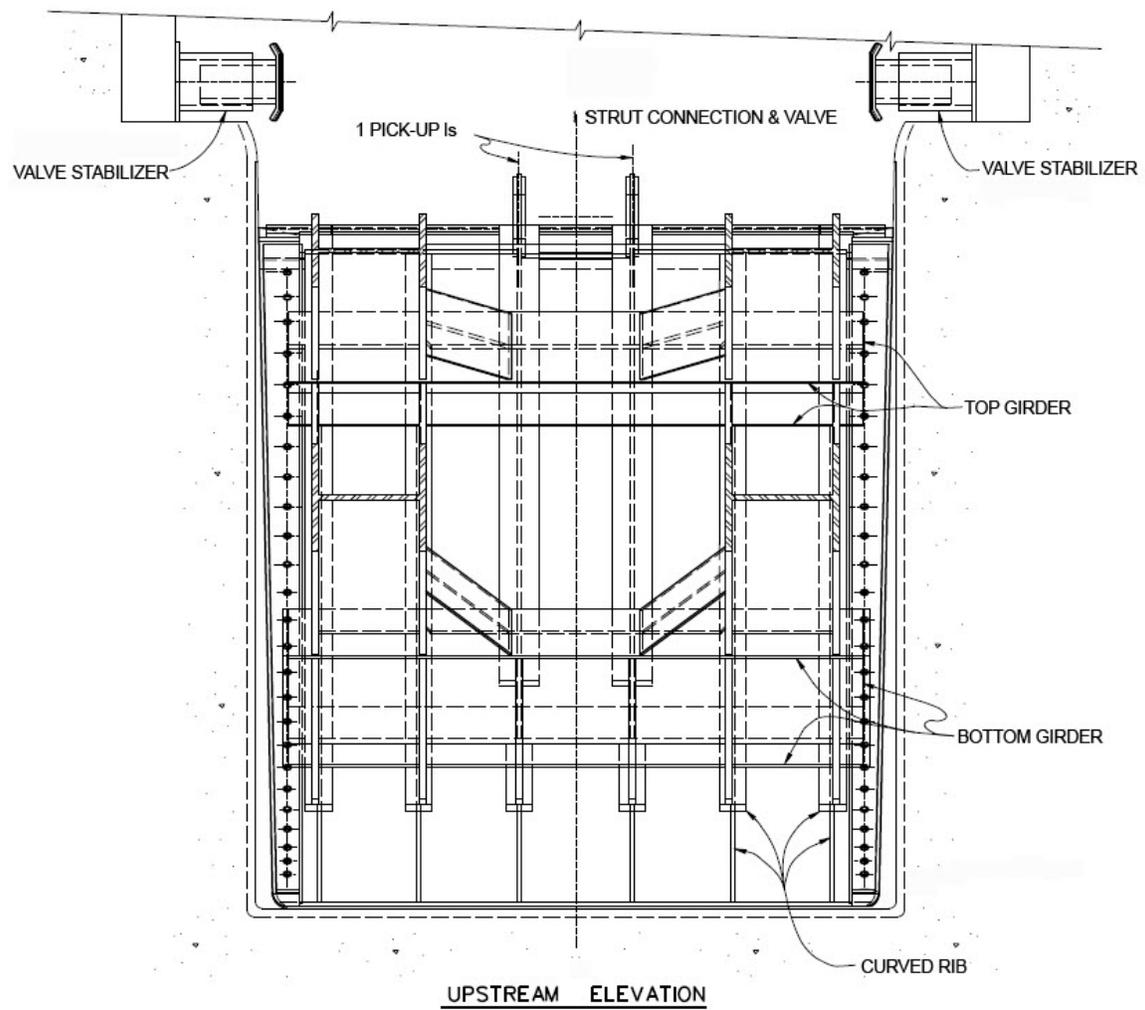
Line drawings of dampers installed on valve recess walls, Chickamauga Lock.
